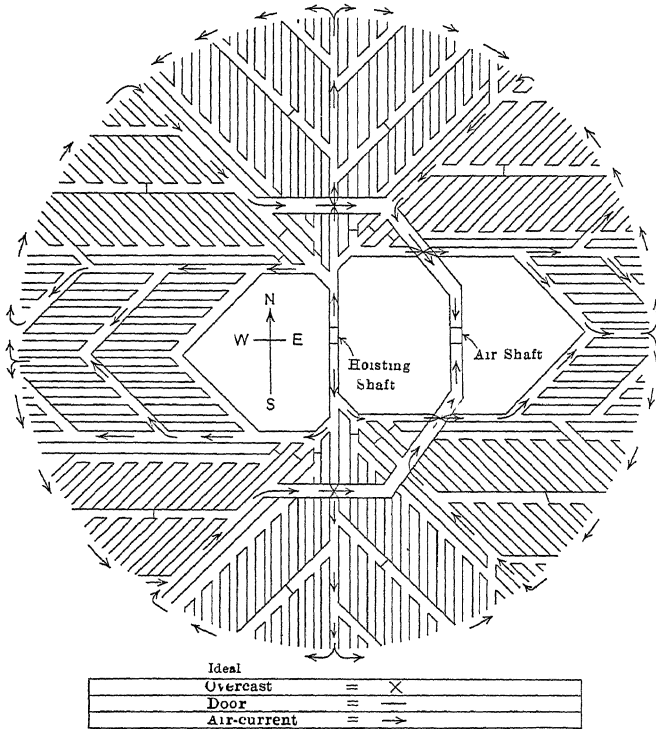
ARRANGEMENT OF ENTRIES AND ROOFS.
